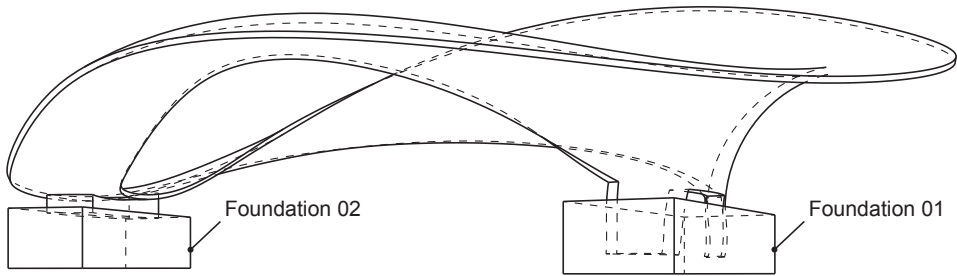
Positions of foundations; shell structure of *Möbiusban(k)d* clamped into mass foundations to prevent tilting over
